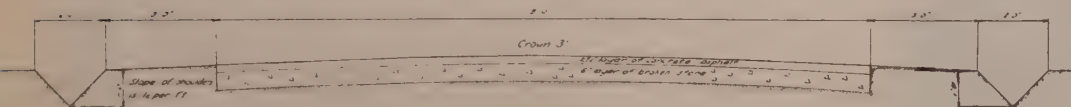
Water-bound Macadam Street Constructed with Ancon Quarry Rock.
